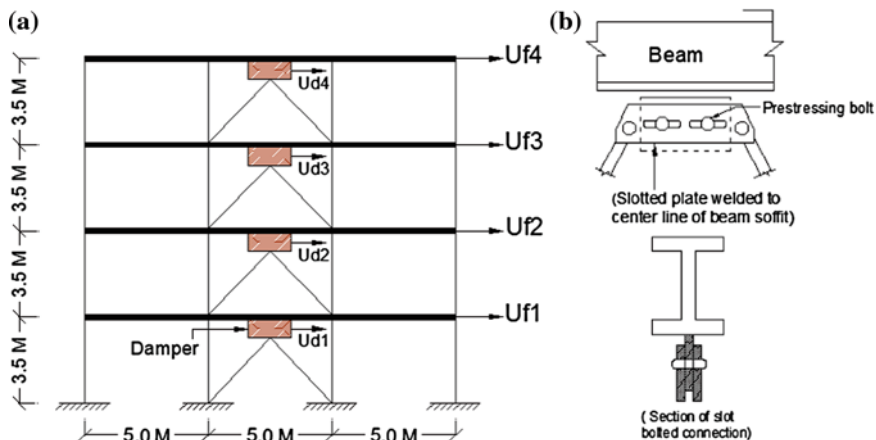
Schematic diagram of building with supplemental damping systems. a Damper added building MDOF system with damper. b Details of friction damper
